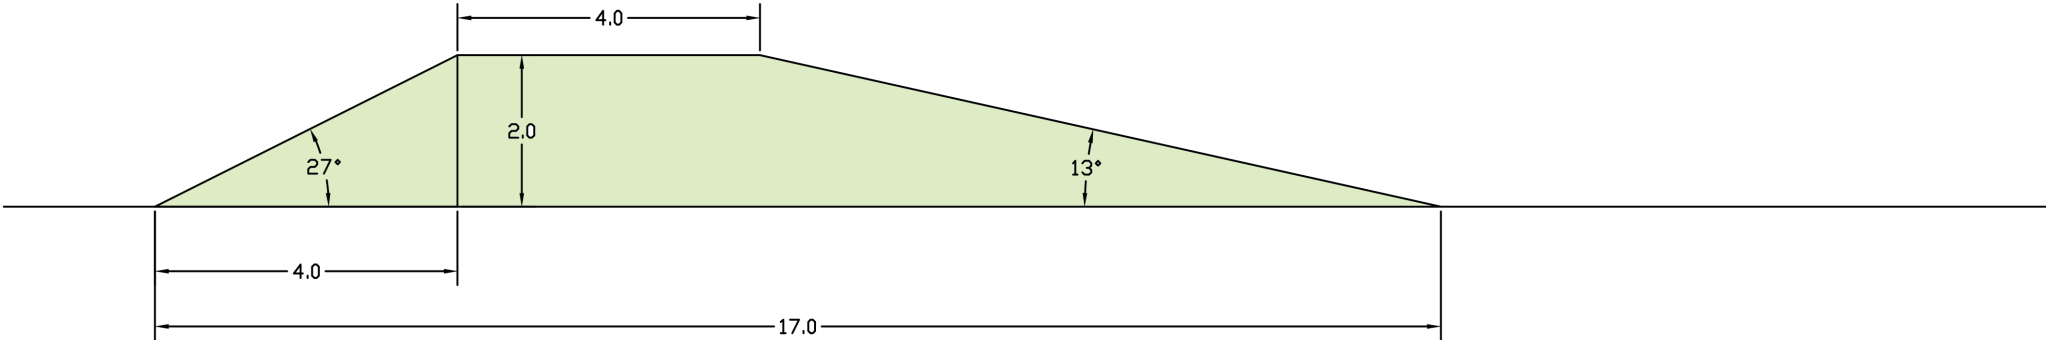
Raised ground element in the new boat harbor area from the side view. (Detail drawing 1:50)
